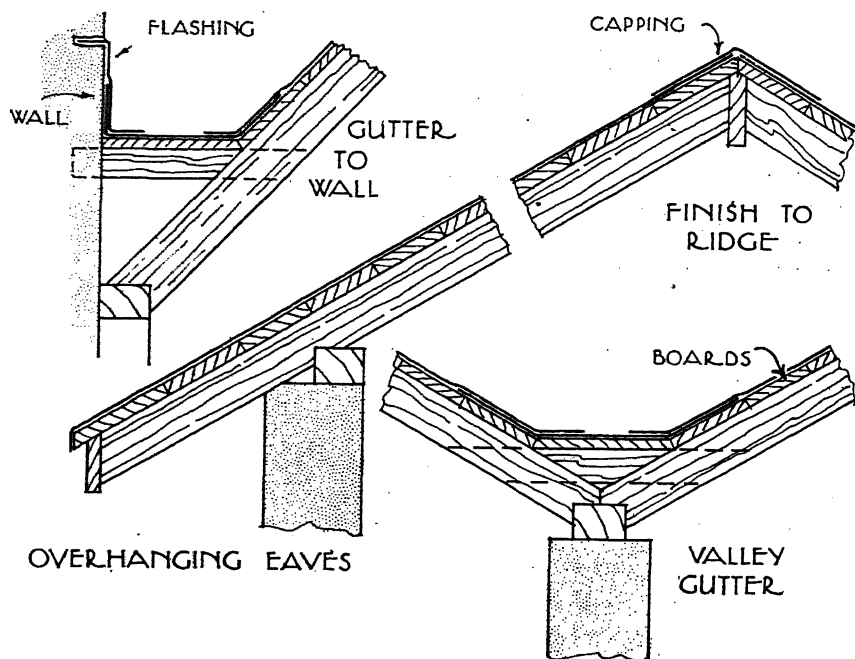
BITUMINOUS FELT ON TIMBER ROOF. SINGLE LAYER
